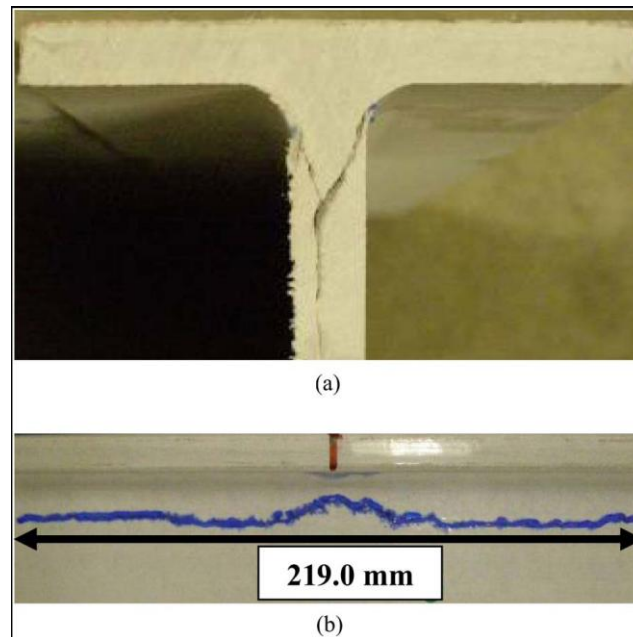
SW-W8-VE-NP-4 specimen: (a) wedge failure; (b) longitudinal cracking.
